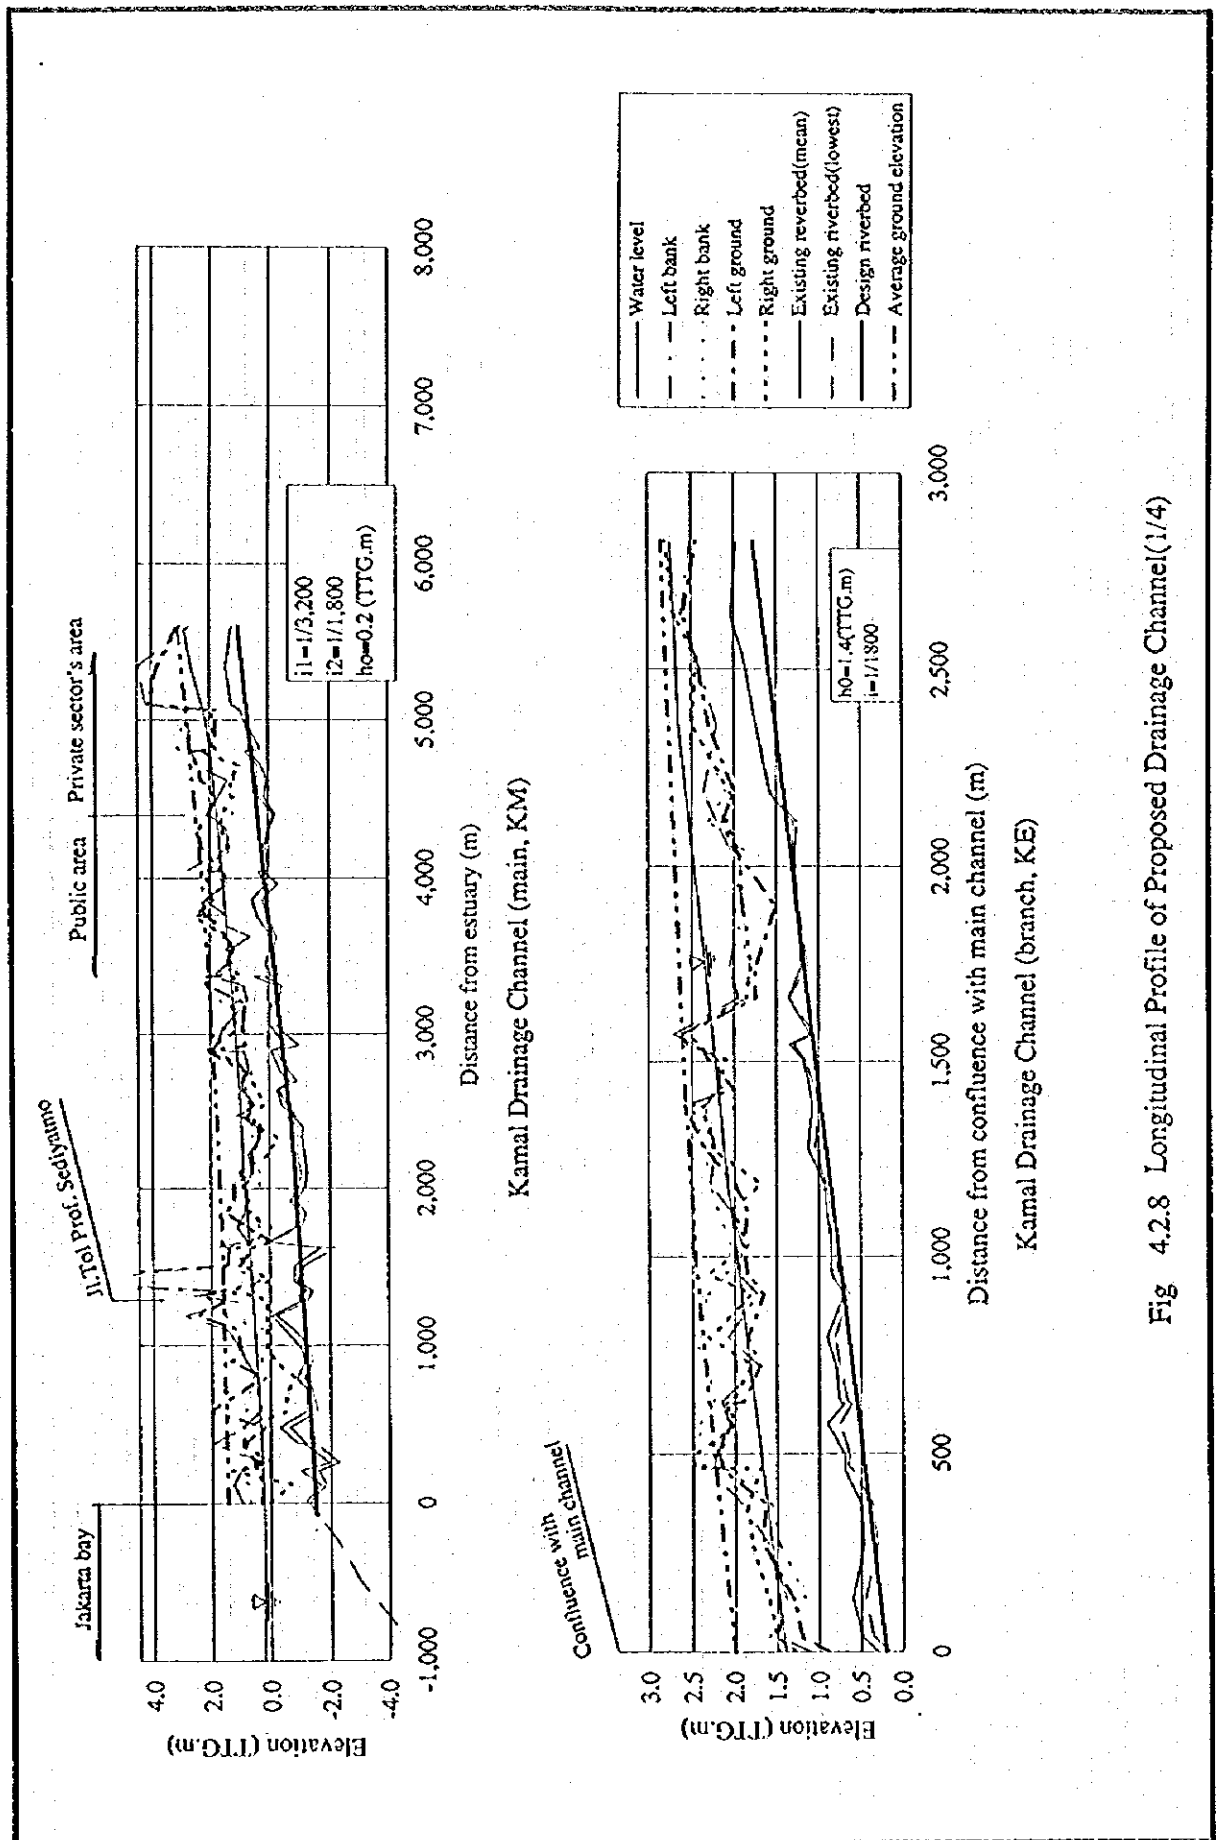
Longitudinal Profile of Proposed Drainage Channel(1/4)
